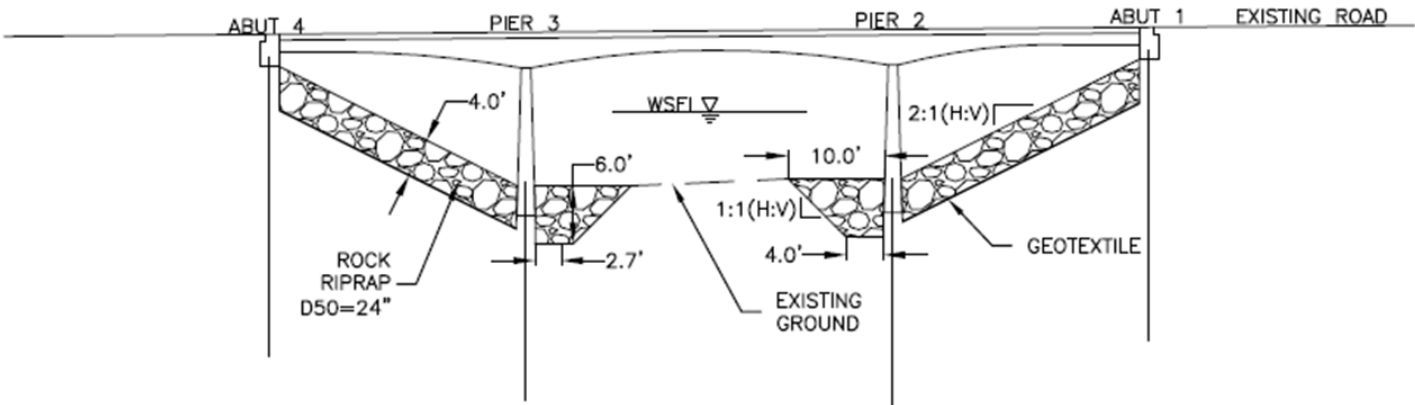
Cross-sectional view of Bridge G-18-H with recommended hydraulic scour countermeasures
